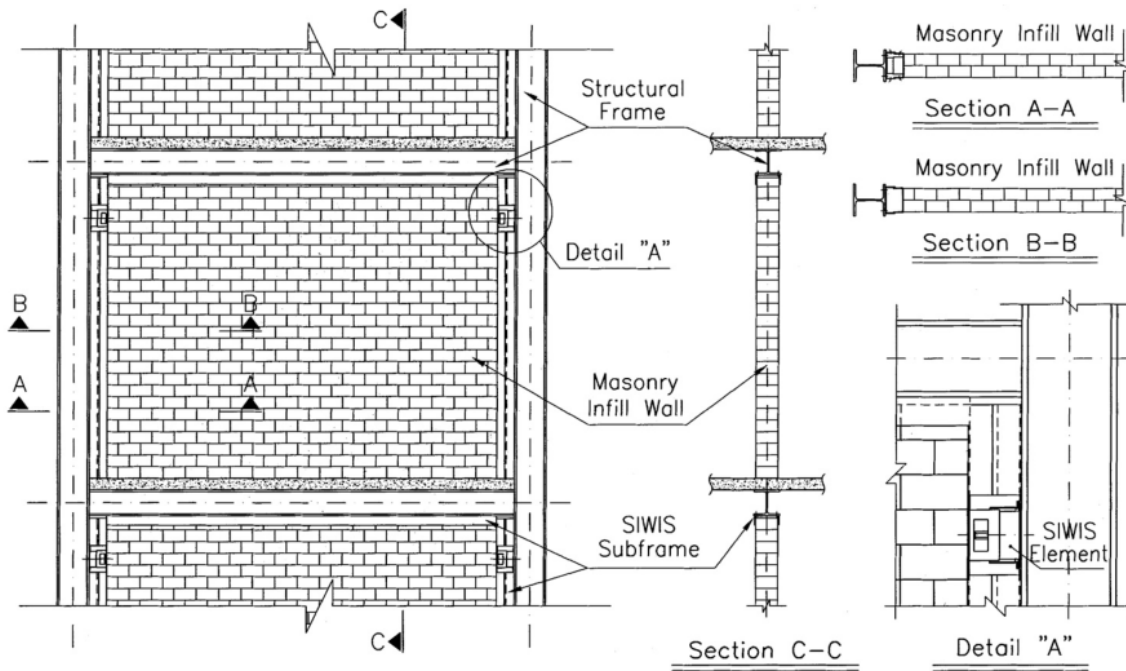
An example of SIWIS sub frame system used in a building frame [11]
